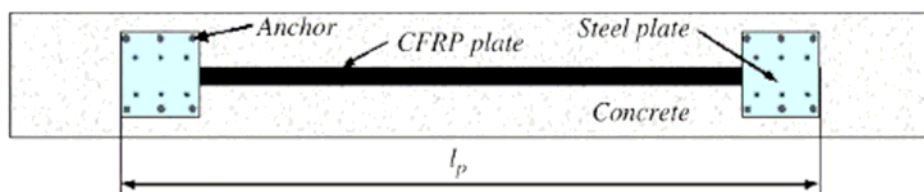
Beams specimen and the anchorage system (Sang 2008)
